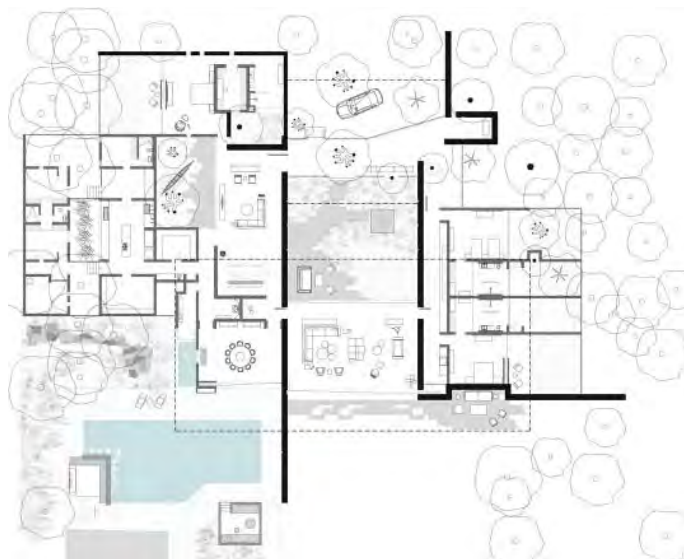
Diya Residence Floor Plan (ArchDaily, 2017)
